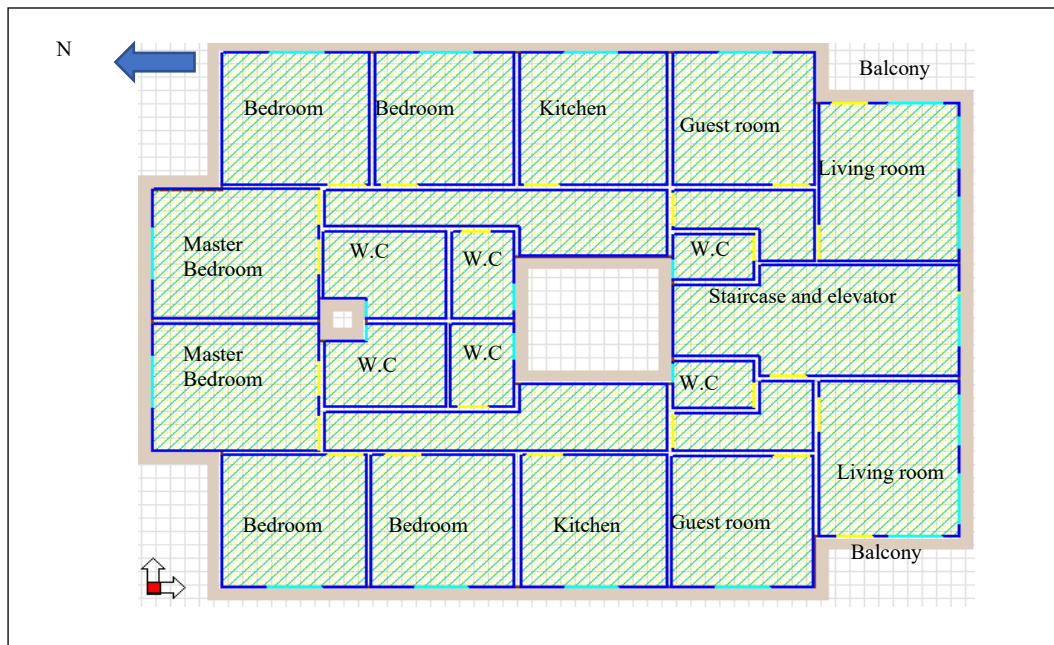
Typical floor plan for the simulated multi-family building in Amman, Jordan
